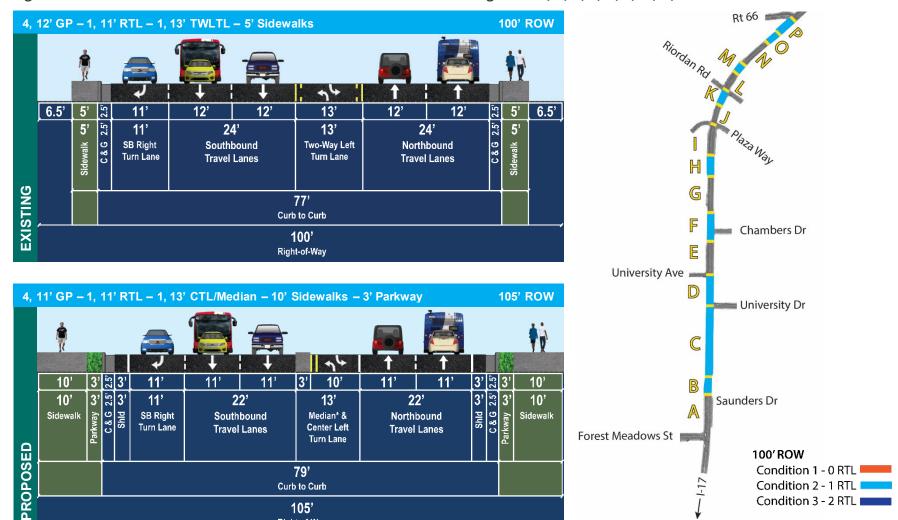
Short-Term Recommended Cross Section for Milton Road Segments B, C, D, F, H, K, M, O, & P
